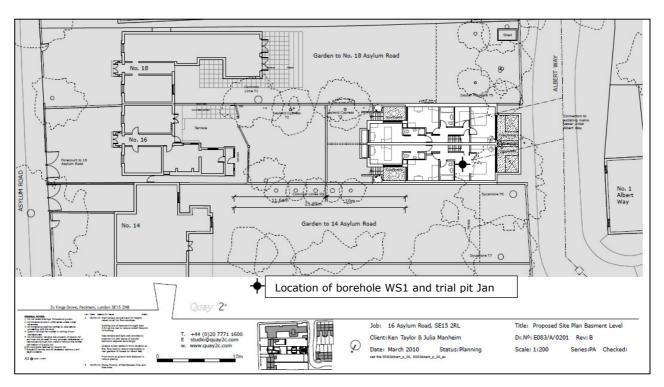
Proposed development at 16 Asylum Road. Two new houses are shown in white. Existing is in grey.
